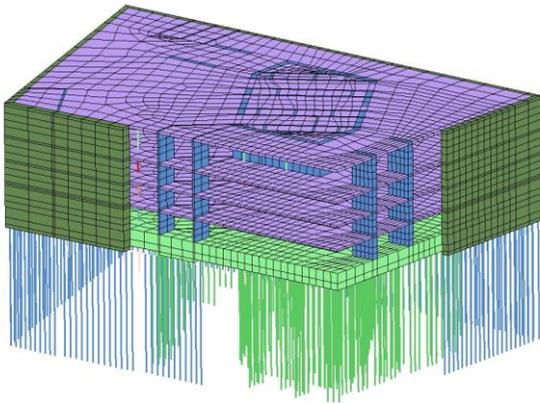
3D view the underground part of the construction - diaphragm walls, slabs, cores, foundation slabs, barrettes
